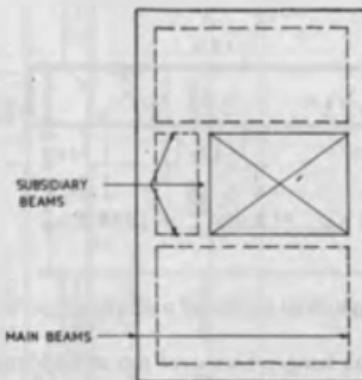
Extra beams around large cut-outs in slab in plan.
